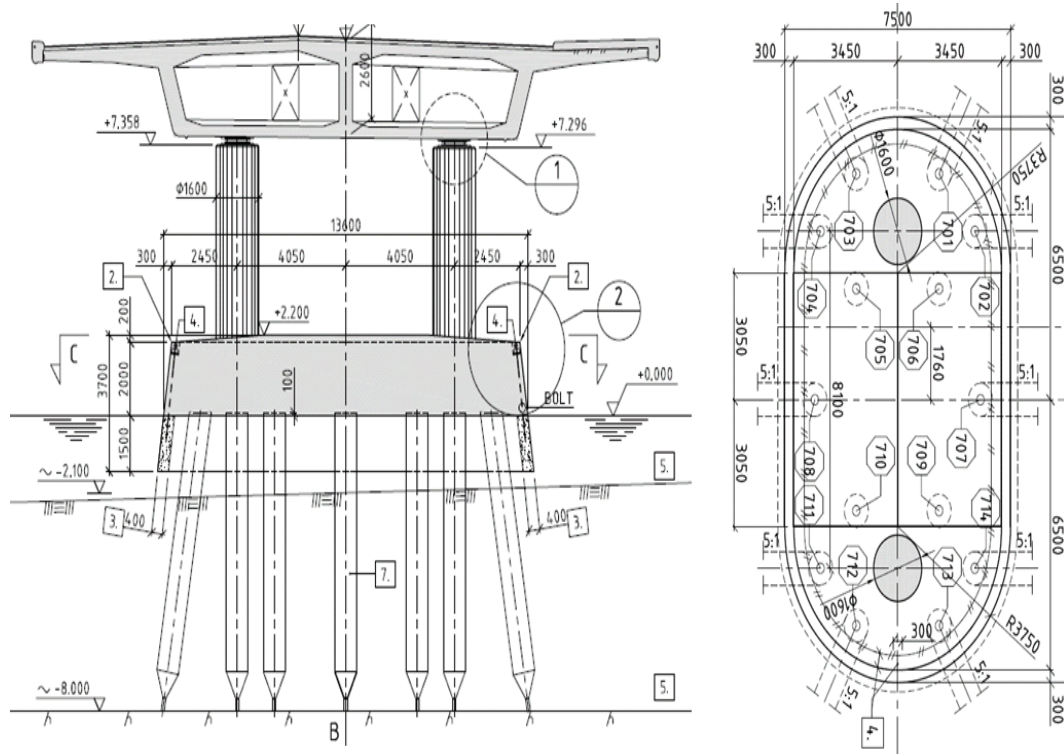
Tverlandsbrua: axis 5: foundation cross-section (left) and foundation plan view (right). [7]
